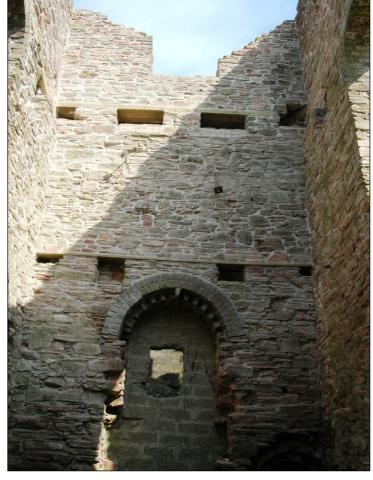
Internal view of the stamps engine house north (gable) wall before works © CC HE Projects 2007
